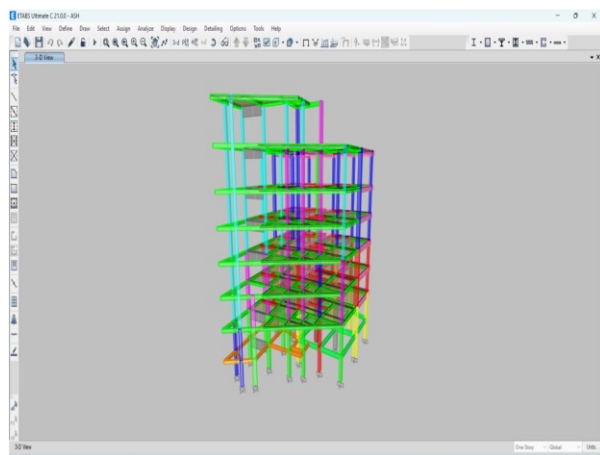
Plan and 3d Model in Etabs.
